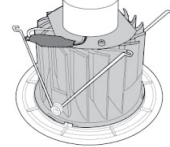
Squeeze torsion springs and insert into recessed housing.
